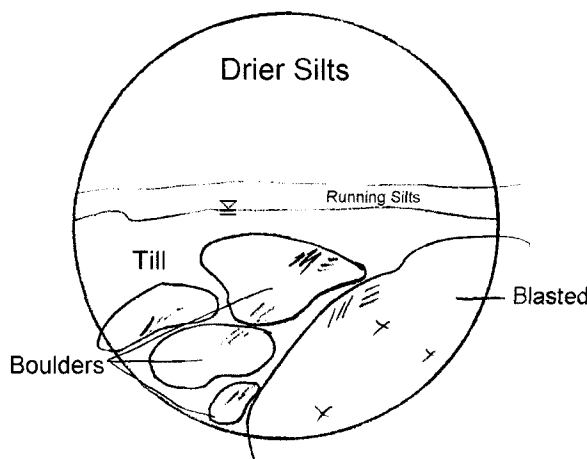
Unforeseen Boulder Pavement in Pipe-Jacked Excavation.
